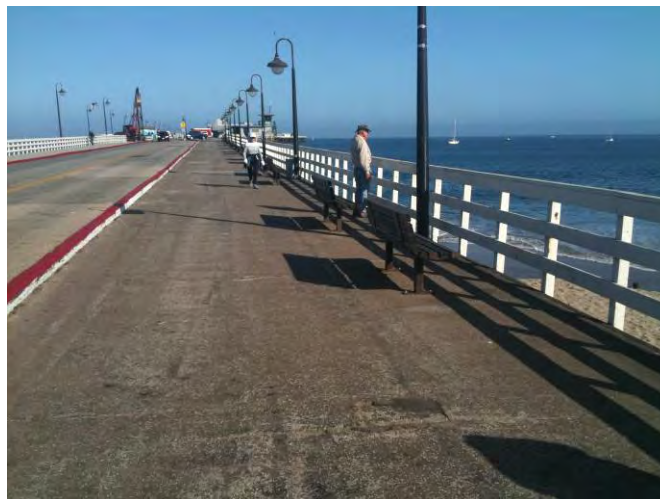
Walkway on West Side of Trestle-16 ft width, Asphalt
